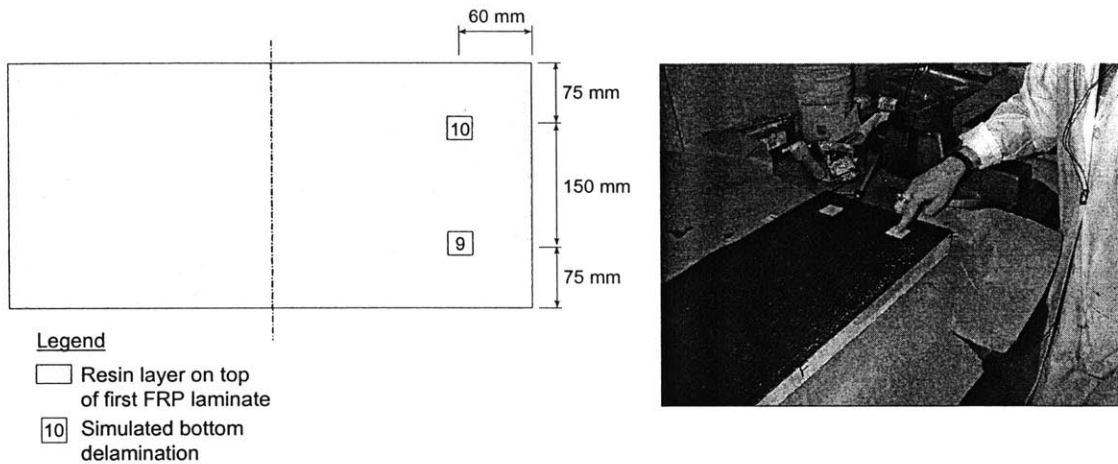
Location (plan view) and placement of bottom delaminations
